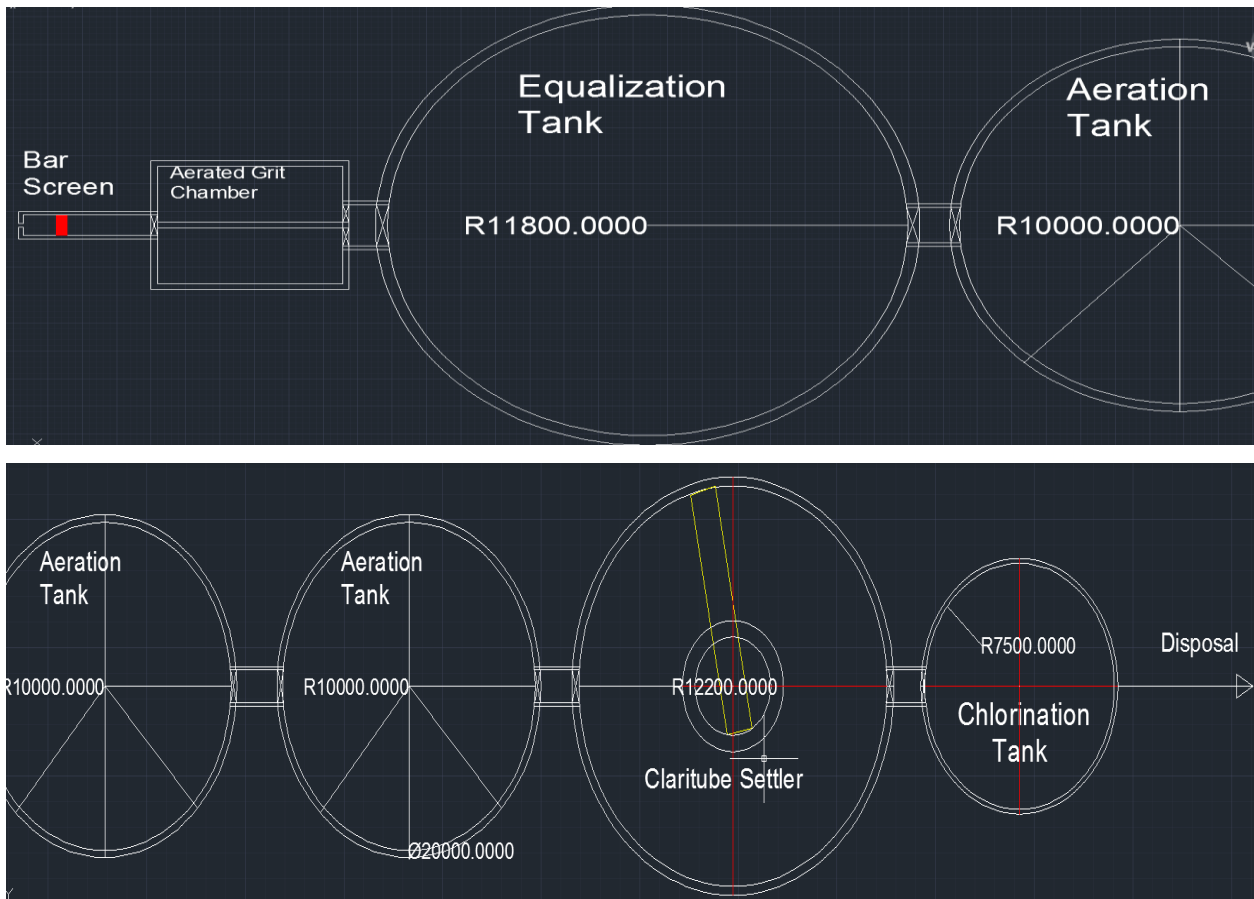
and Plate 4.6 Zoomed in look at the Section of Proposed STP
